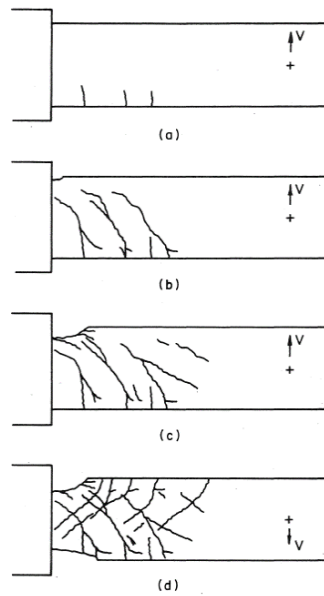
Crack pattern development (Wight and Sozen, 1973)
